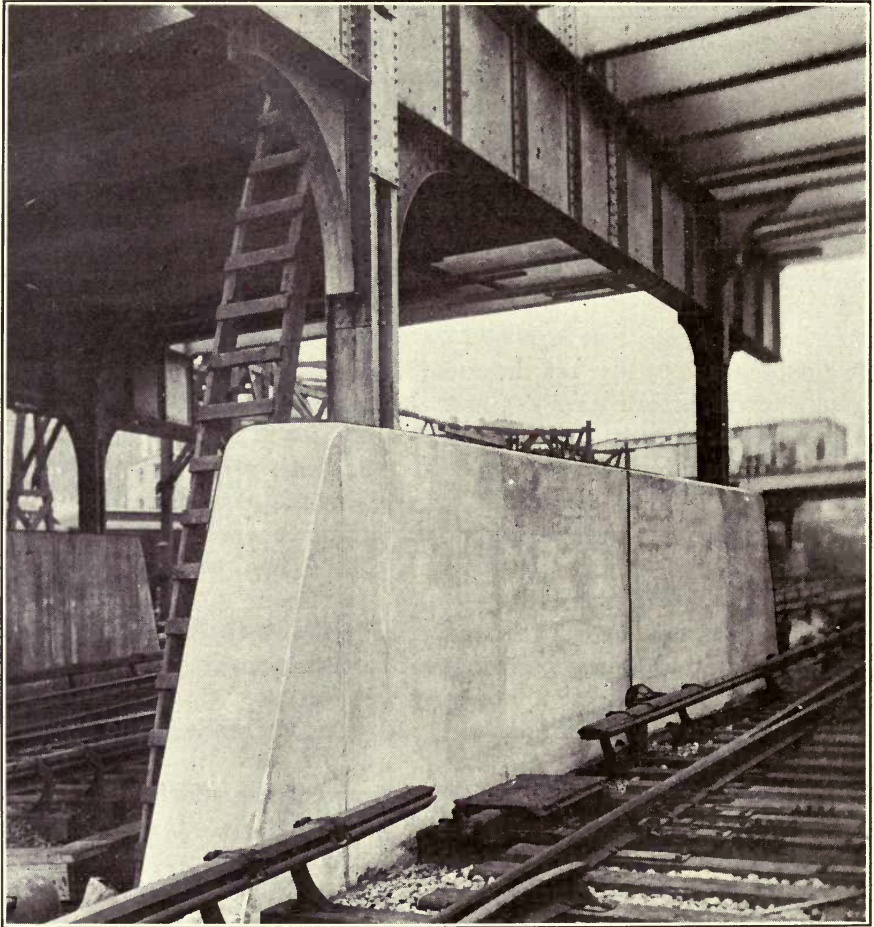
CONCRETE PROTECTION PIER, N. Y. C. & H. R. R. R.
